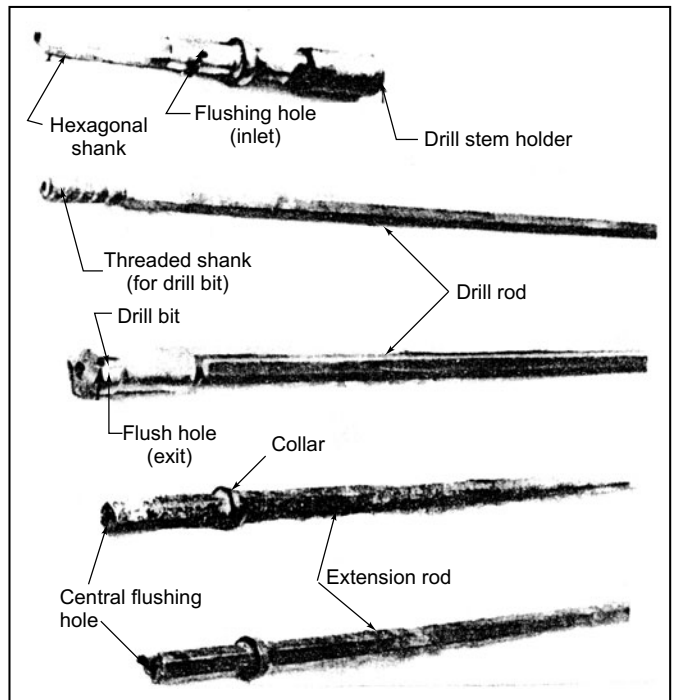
Drill stem equipment for making horizontal and vertical bores in open wells
